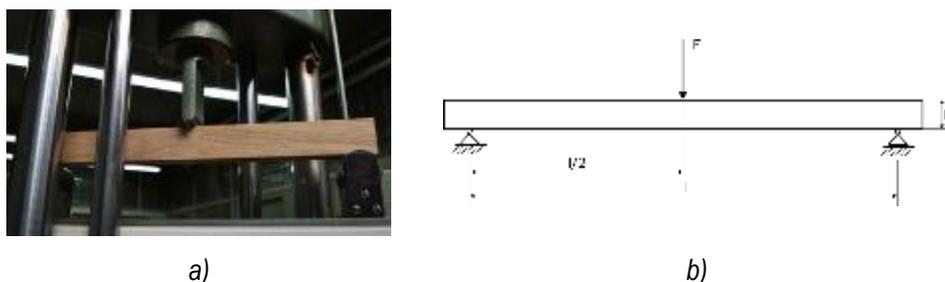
Three-point bending test: a) set-up of joint specimen in testing machine, b) diagram of loading
